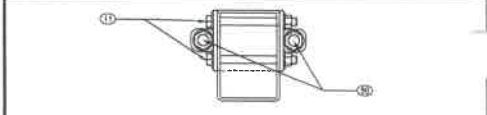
UNBRACED BAY TO UNBRACED BAY AT BOLT IN WEB
